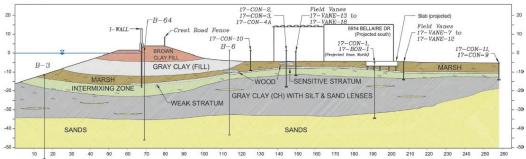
Cross section flood defence 17th Street Canal, before failure (Seed, et al., 2008c) measures in feet
